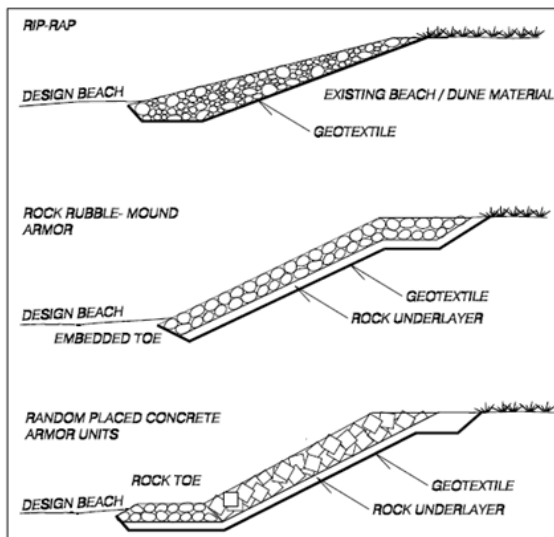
Examples of sloping front rubble-mound seawall/revetment structures
